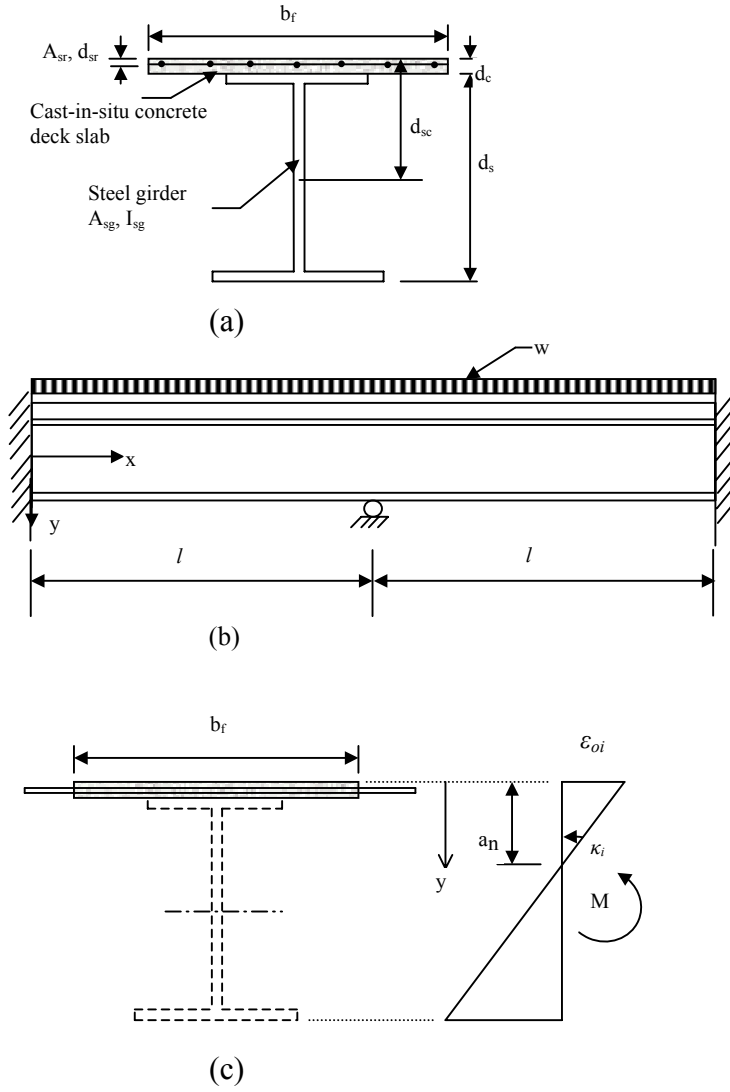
Details of Composite Integral Abutment Bridge System: (a) Cross Section; (b) Elevation; (c) Transformed Section and Strain Diagram
